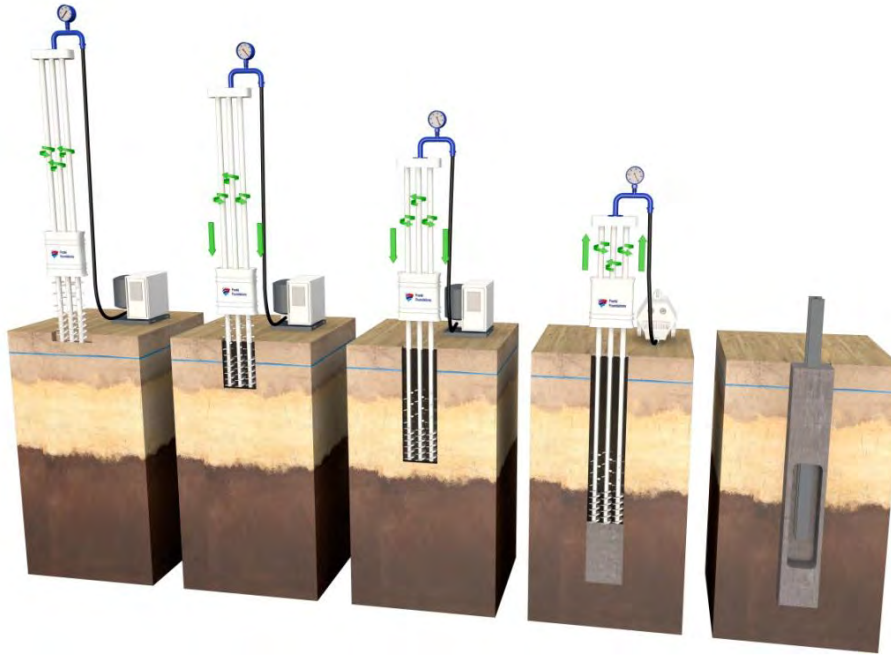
Steel beam wall constructed using DCM technique (Franki Foundations, 2021)
